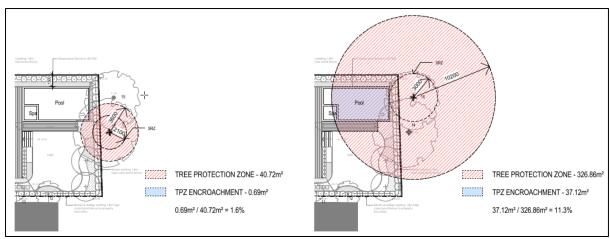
Extract of the illustrated TPZs of Tree 14 (left) and 15 (right) and their proximity to the proposed swimming pool.
